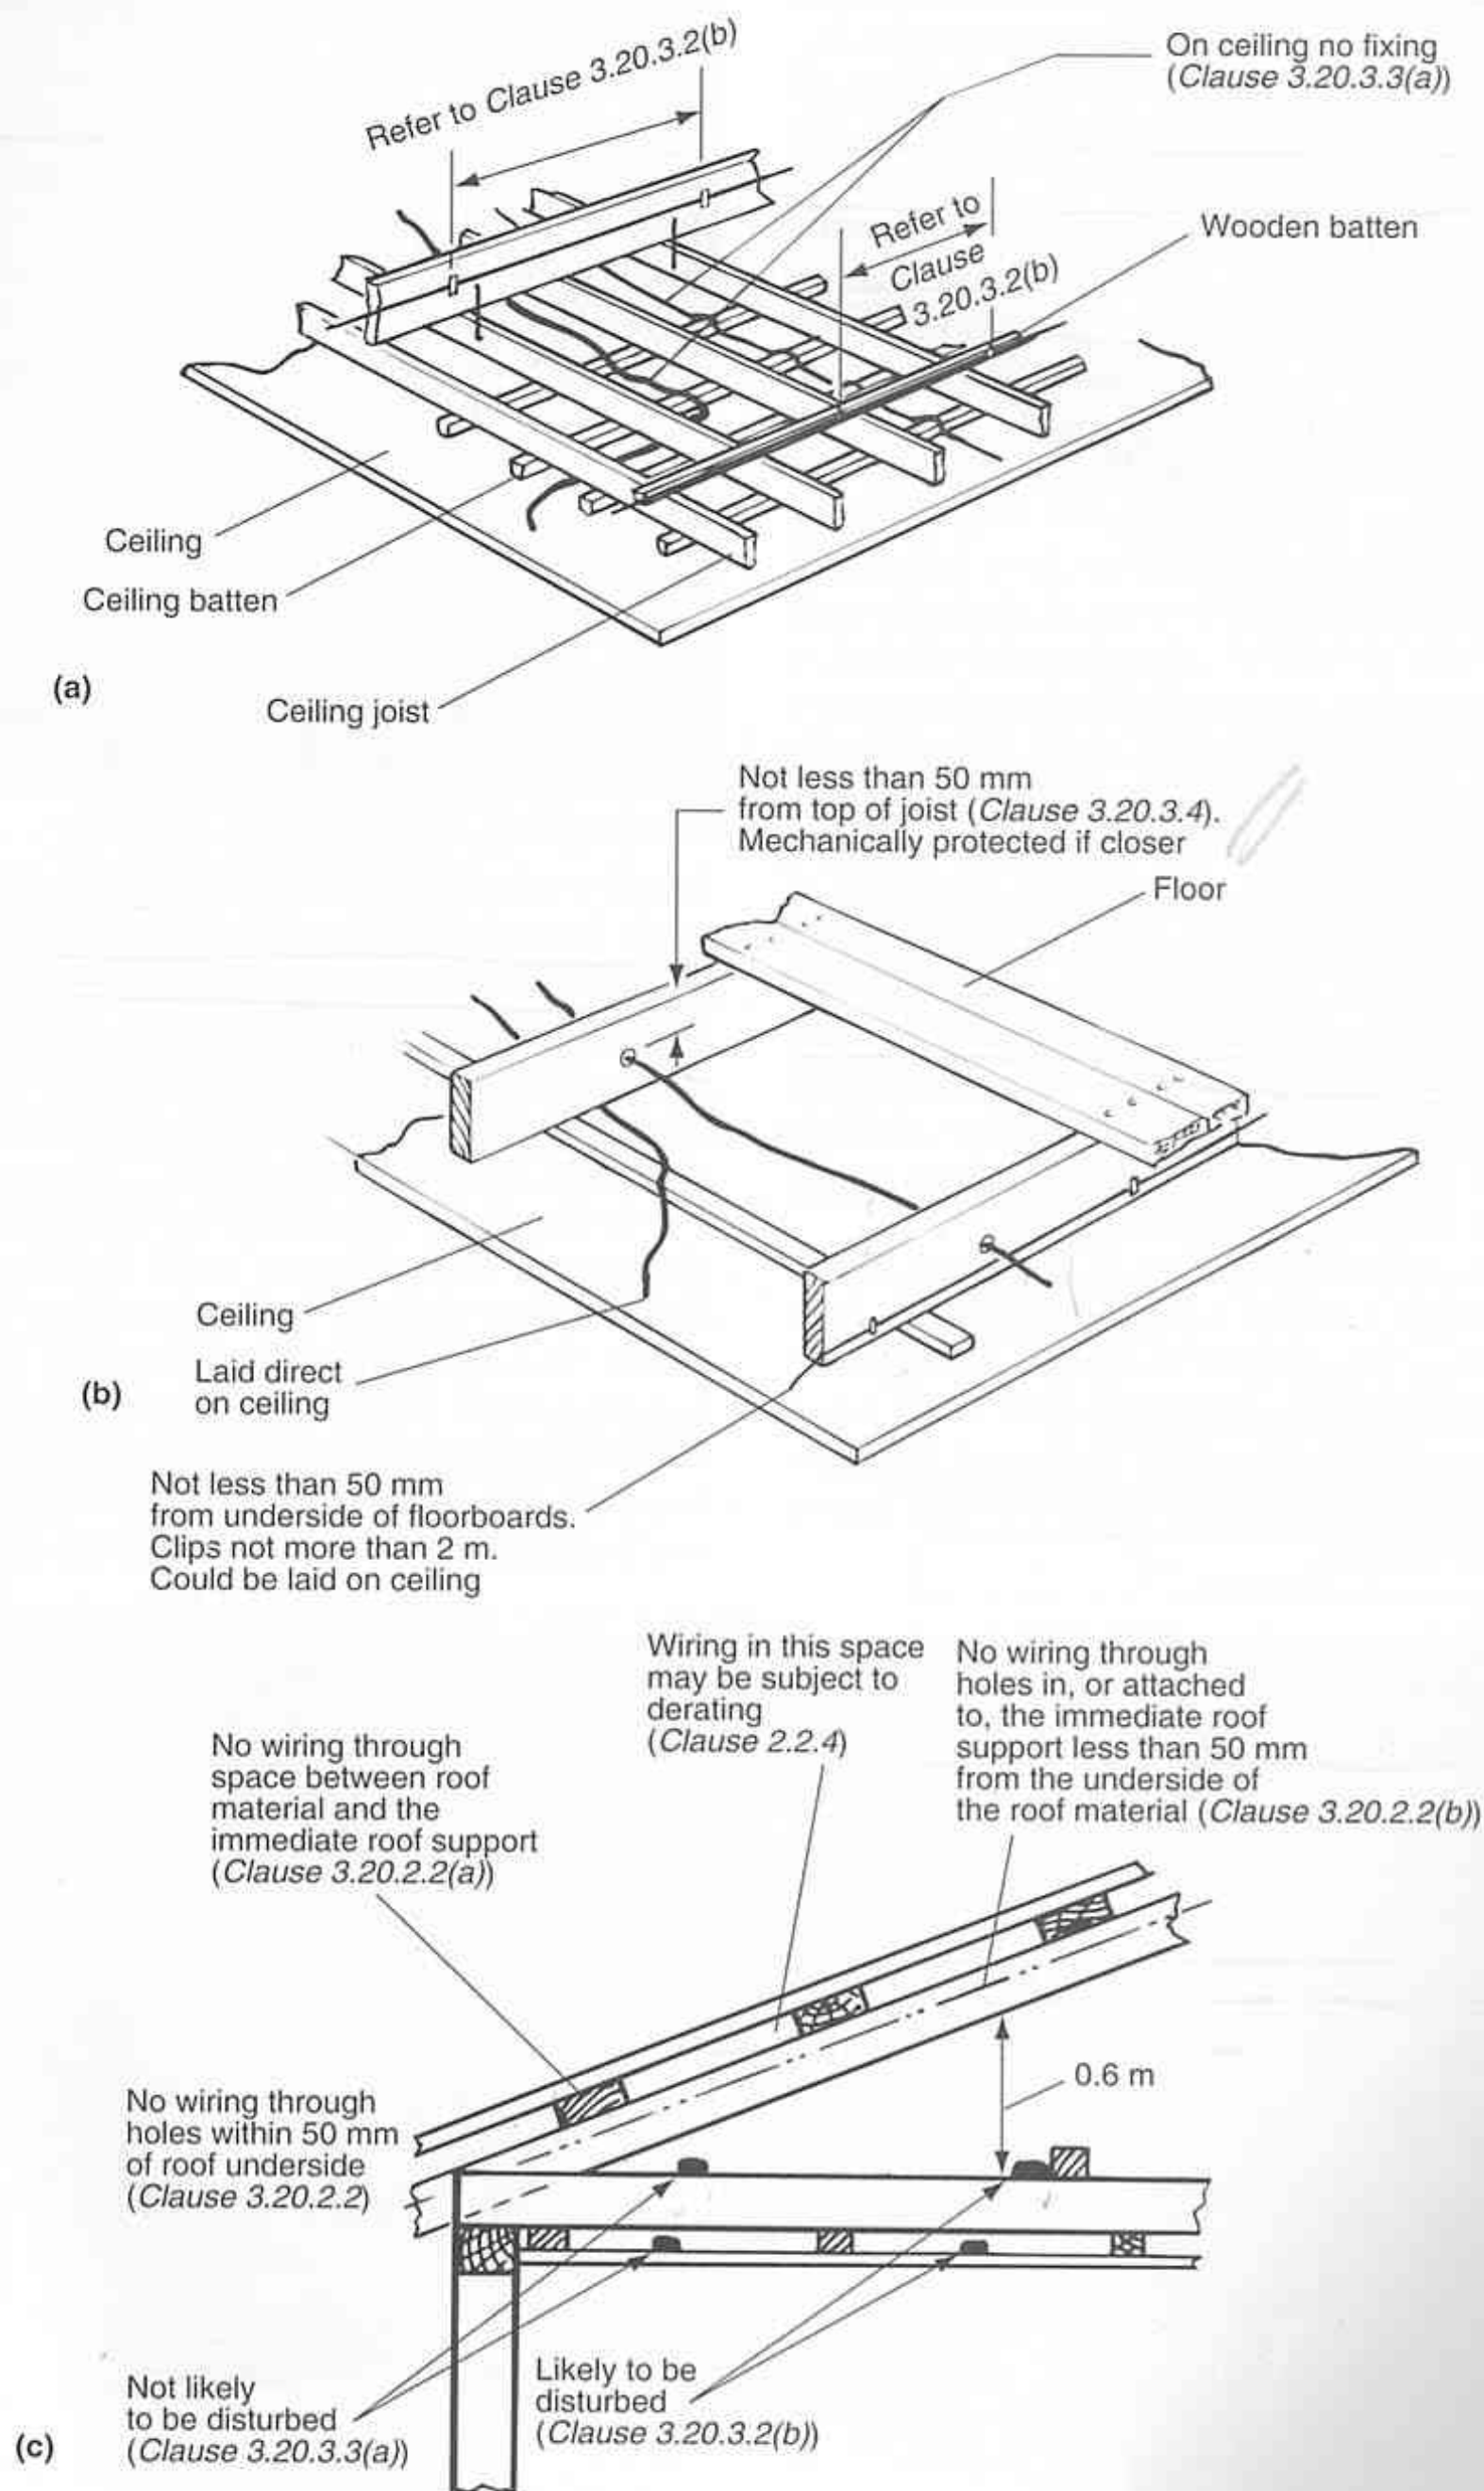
TPS wiring: (a) in a ceiling space; (b) between a floor and an uppermost ceiling; (c) between ceiling and roof
